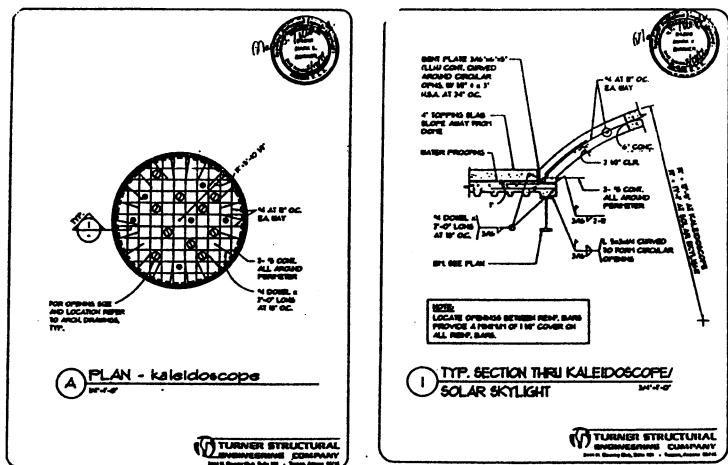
Ventana Vista Elementary School Kaleidoscope: CA structural plan and section
